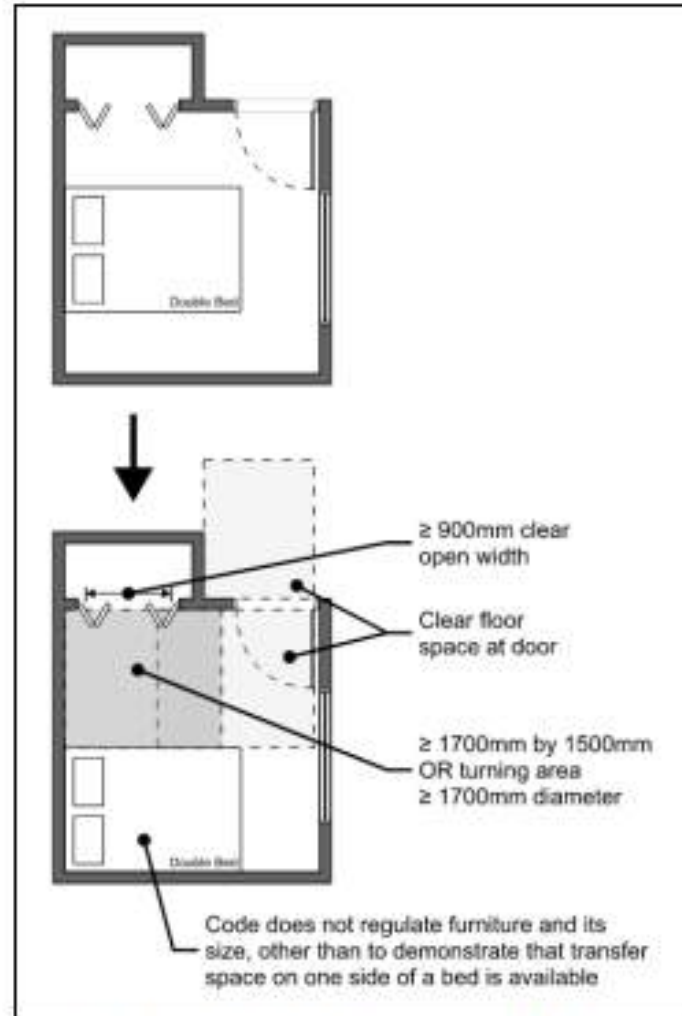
Figure A - Demonstrating Adaptable Clear Floor Space can be Provided
